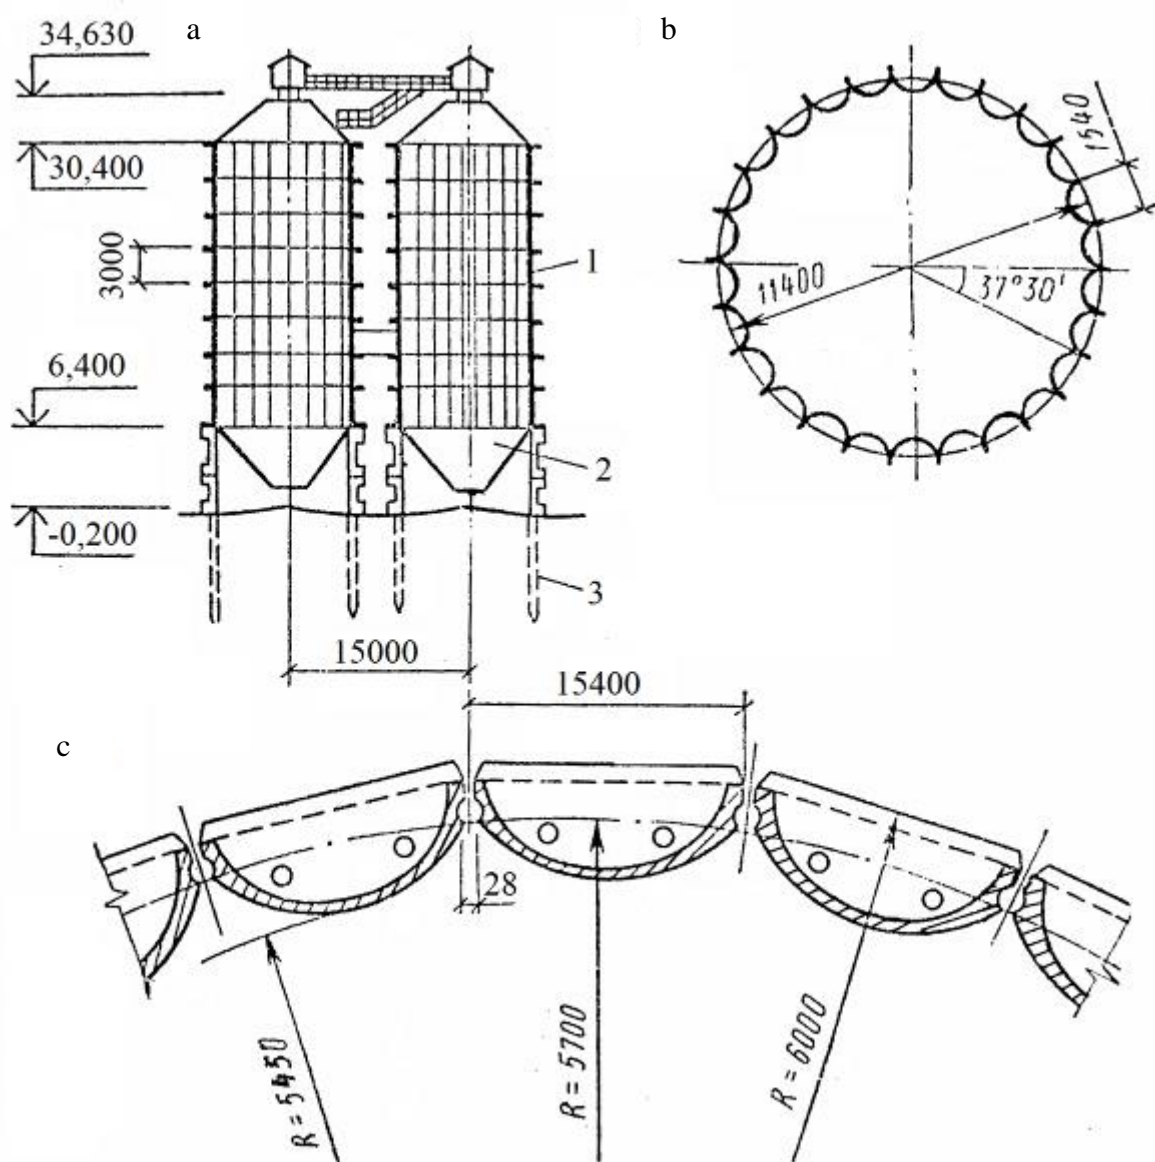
Structural diagrams of a prefabricated round silo with a diameter 12 m with fluted panels: a – section; b – plan; c – plan detail; 1 – shell panels; 2 – metal funnels; 3 – reinforced concrete piles
